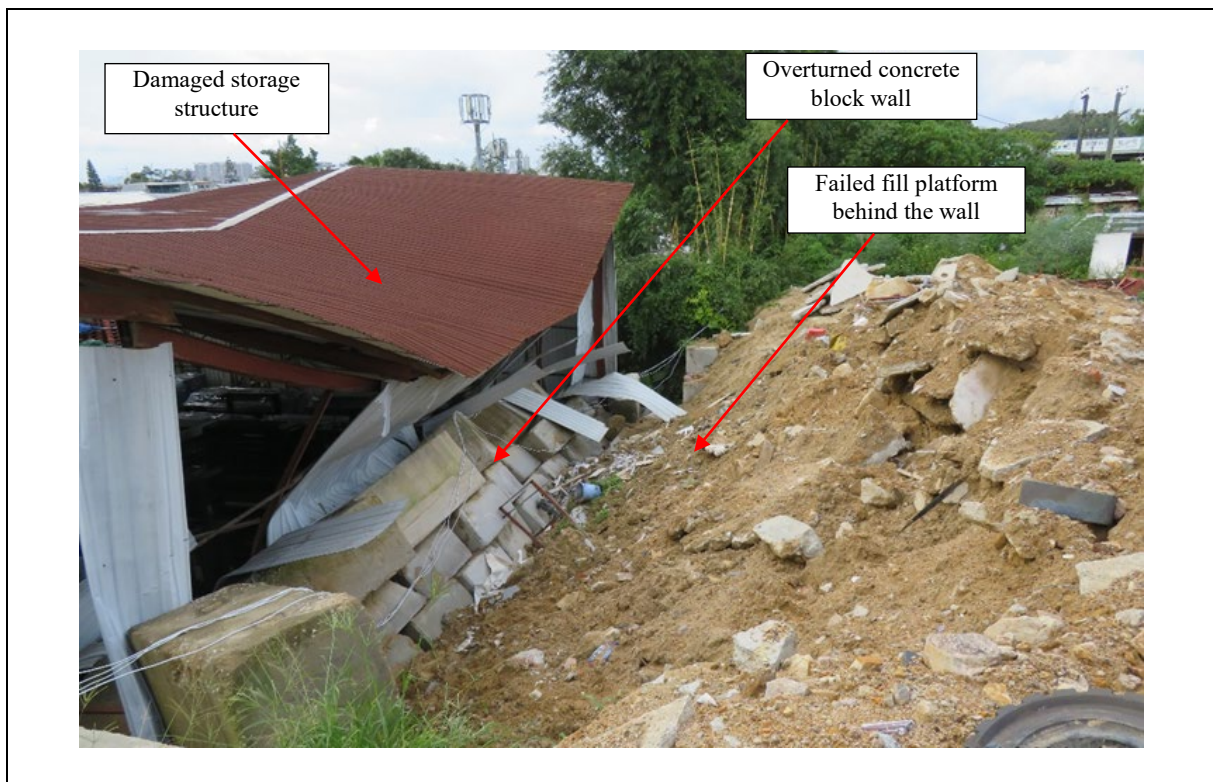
View of the 2 August 2019 Landslide on a Retaining Wall at Tai Tong Shan Road, Yuen Long (Incident No. 2019/08/2481)
